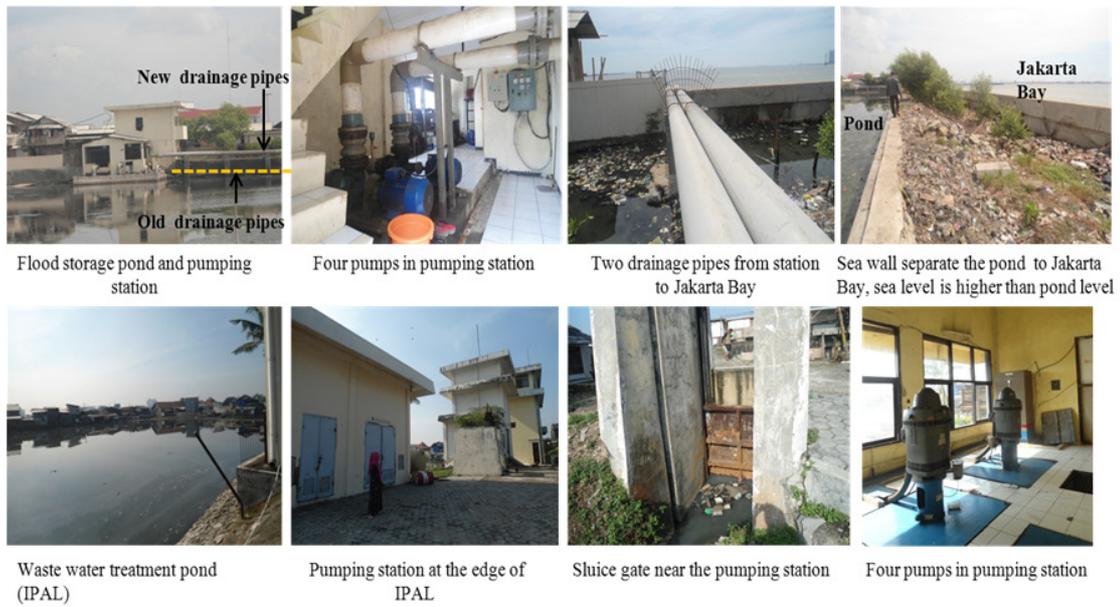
Flood storage pond and waste water treatment pond with their pumps
